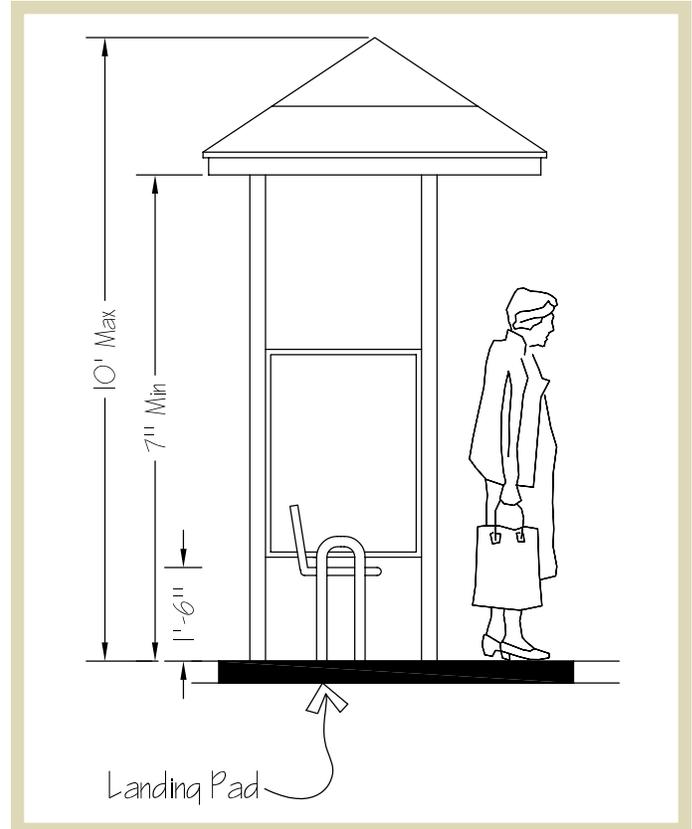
| Cross section of a small shelter with seating with typical vertical dimensions.
